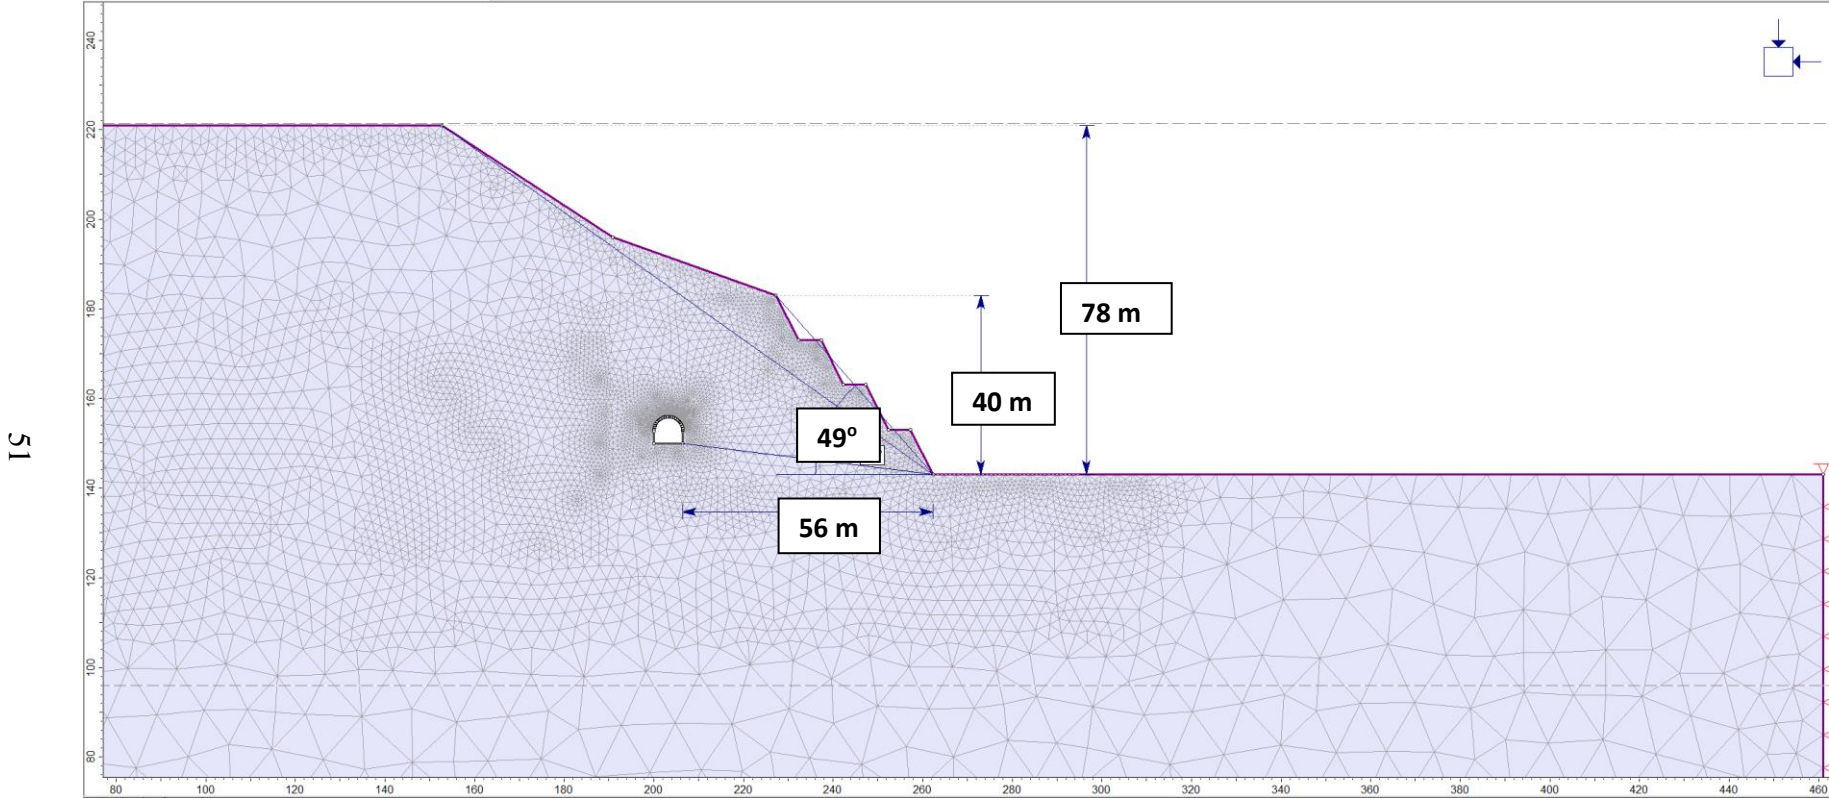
Slope dimensions and finite element model of the planned slope profile, section A-A', Km 26+610
